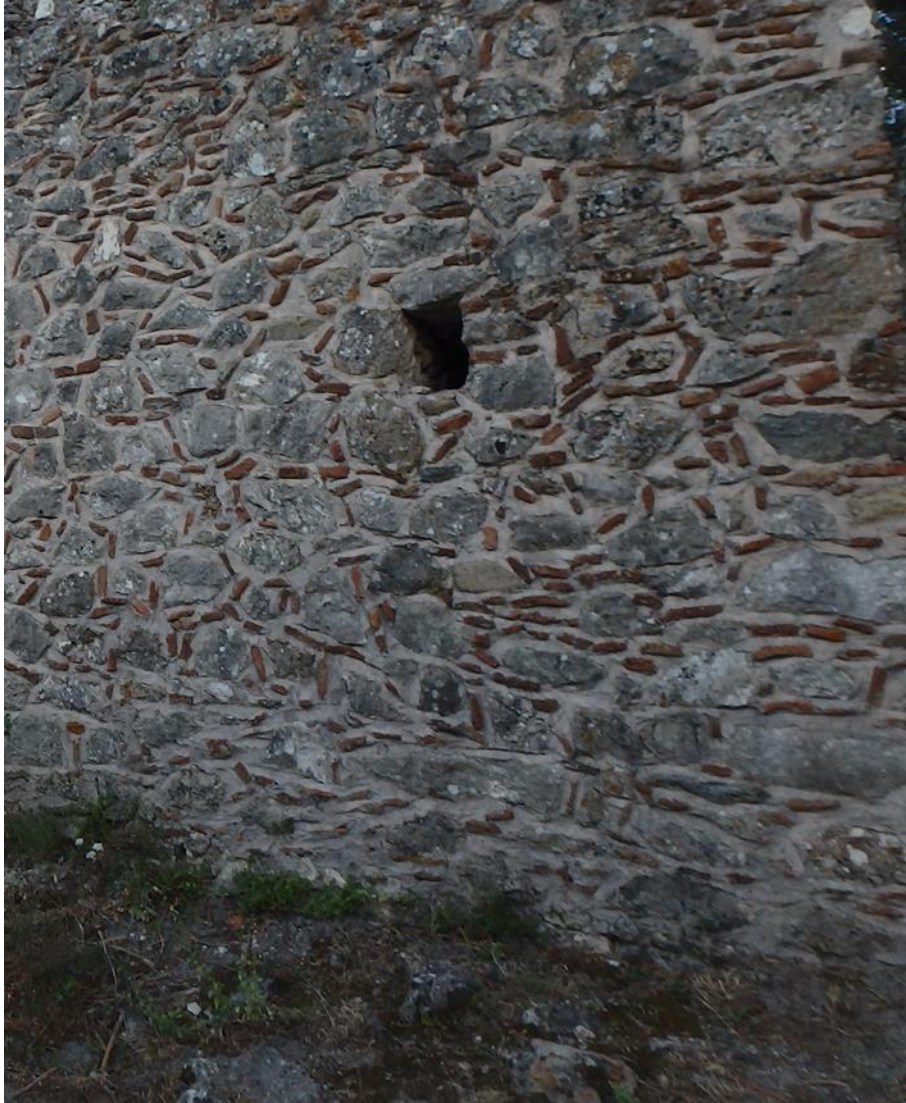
Detail of wall construction from Mystras. (Photo: M. Pawlowski)
